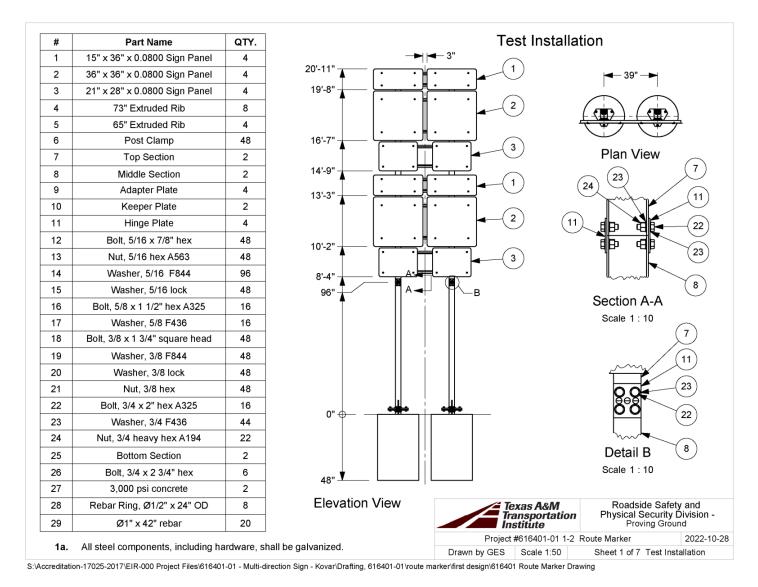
Details of Route Marker Assembly with Large Sign Supports.
